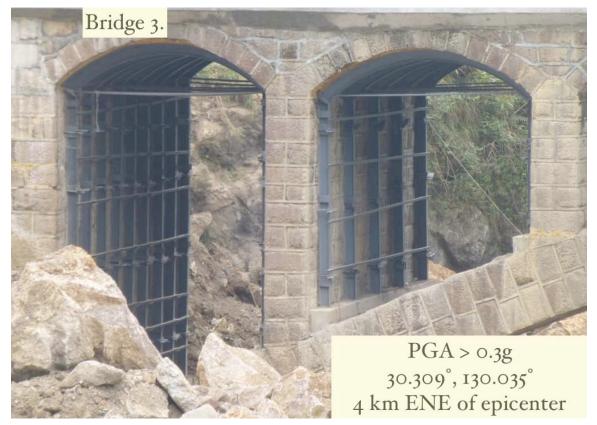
Steel Reinforcement Placed in Bridge 3 (May 31, 2013)
